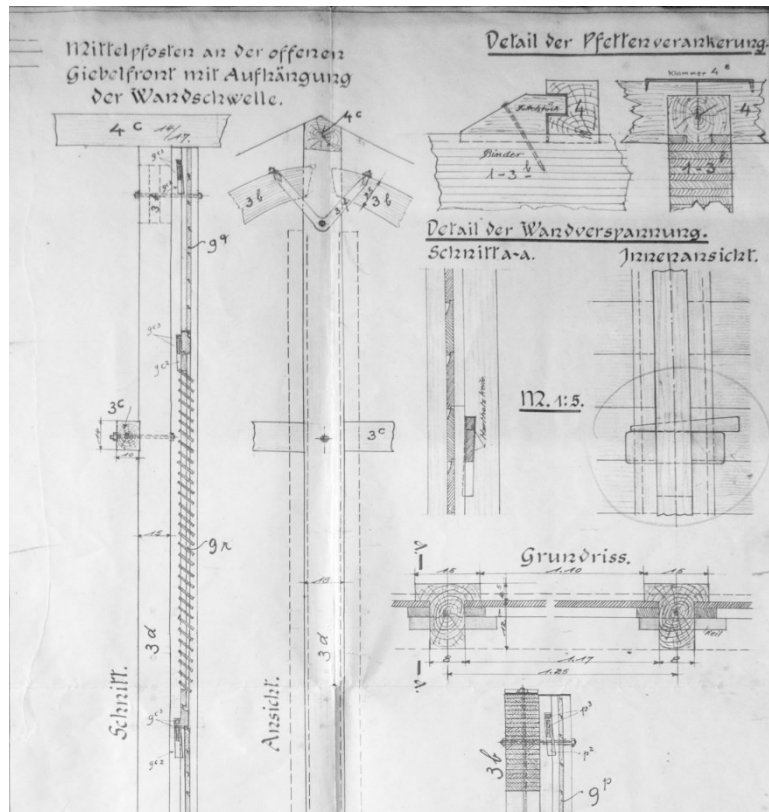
Detail of the connection of the girders at the apex, detail of the connection of the purlins to the girders (top right). Excerpt from the plan of the aeroplane hangar in Frauenfeld. Contractor: B. Zöllig, 1913.
